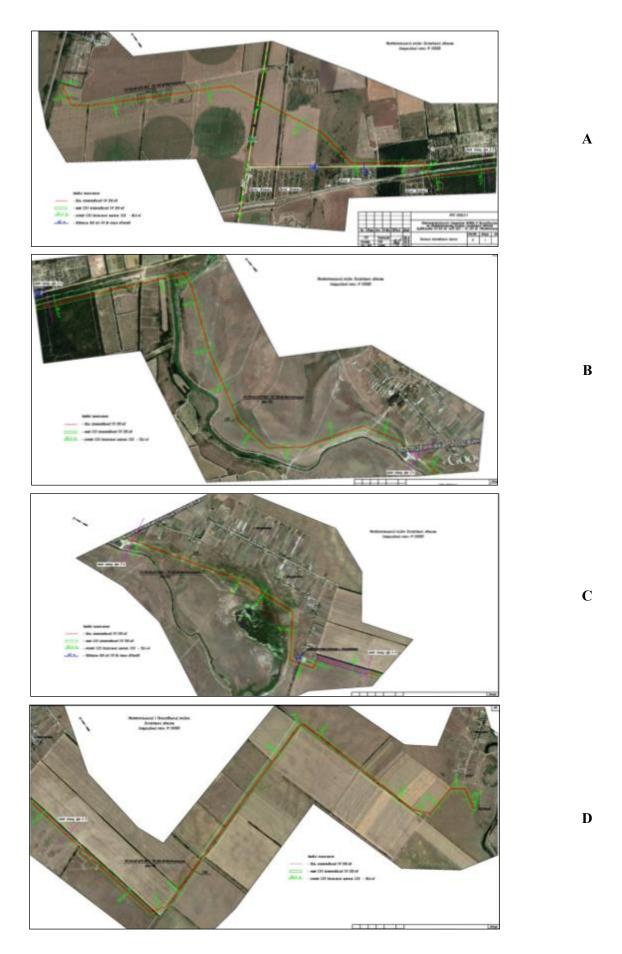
Layout Plan of the Route Sections of the 330 kV OTL Route between the Wind Park Central Substation and Melitopol Substation
